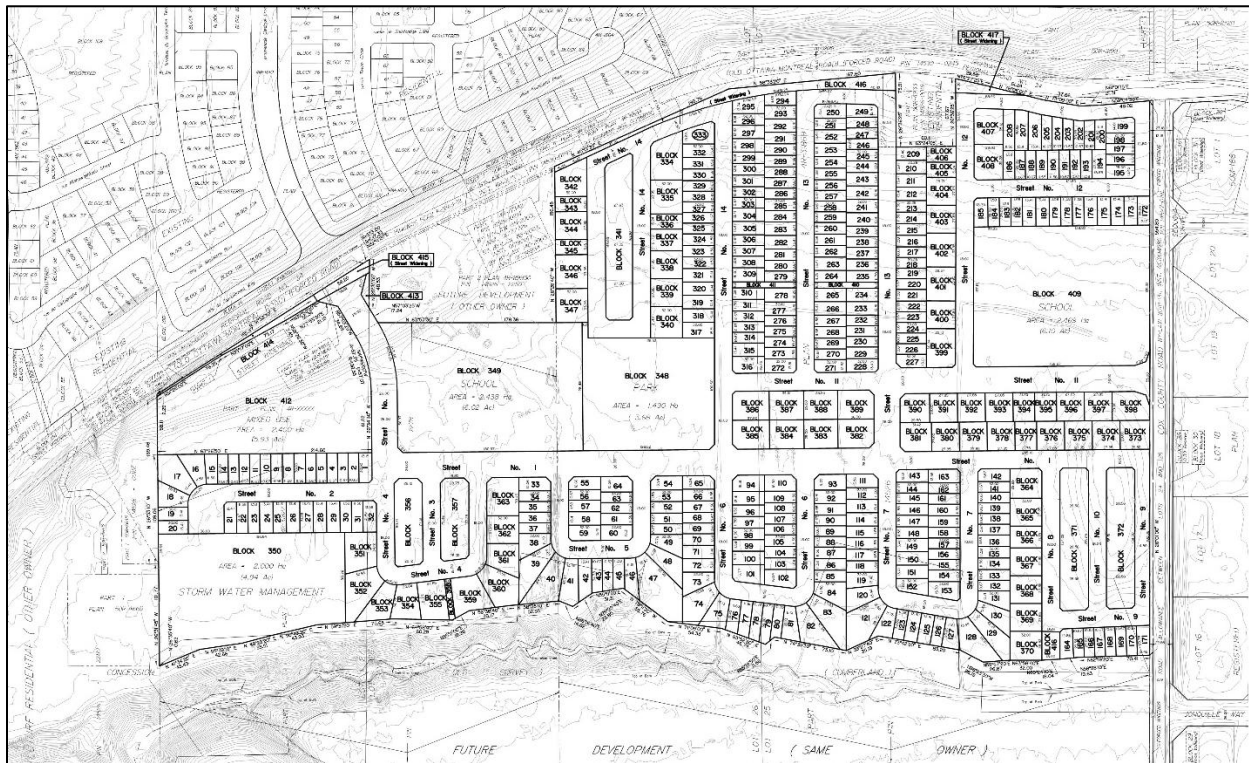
Excerpt from the revised Draft Plan of Subdivision prepared by Annis O'Sullivan Vollebakk Ltd.
